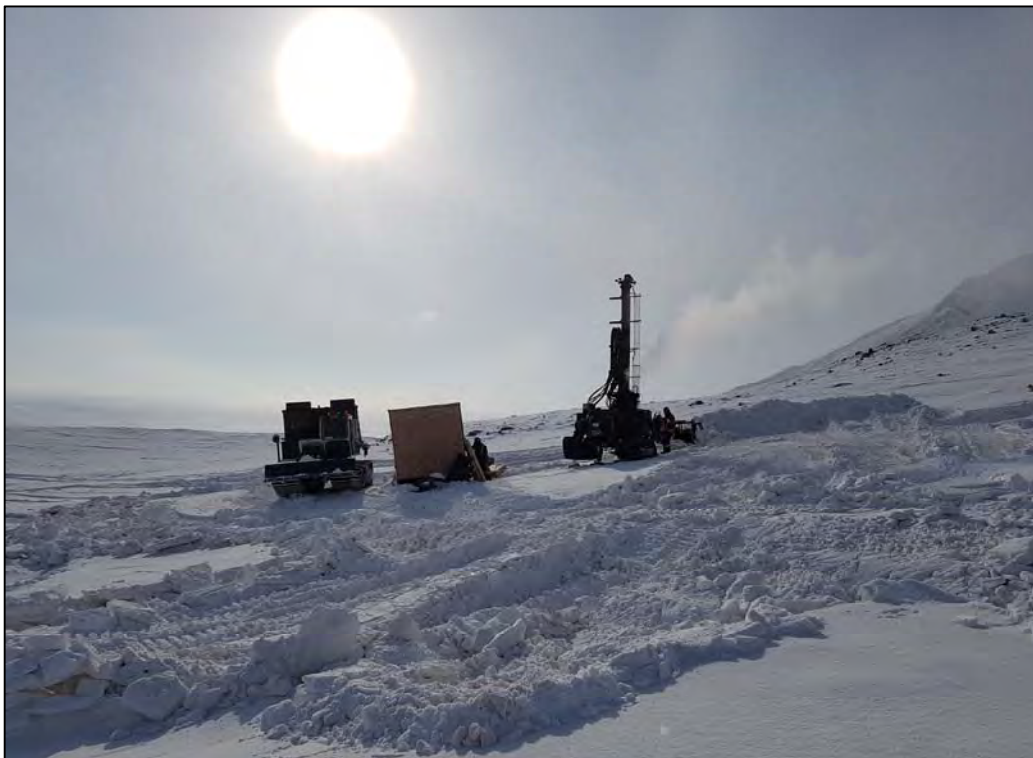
KM107-DH19-04 Looking West During Drilling
